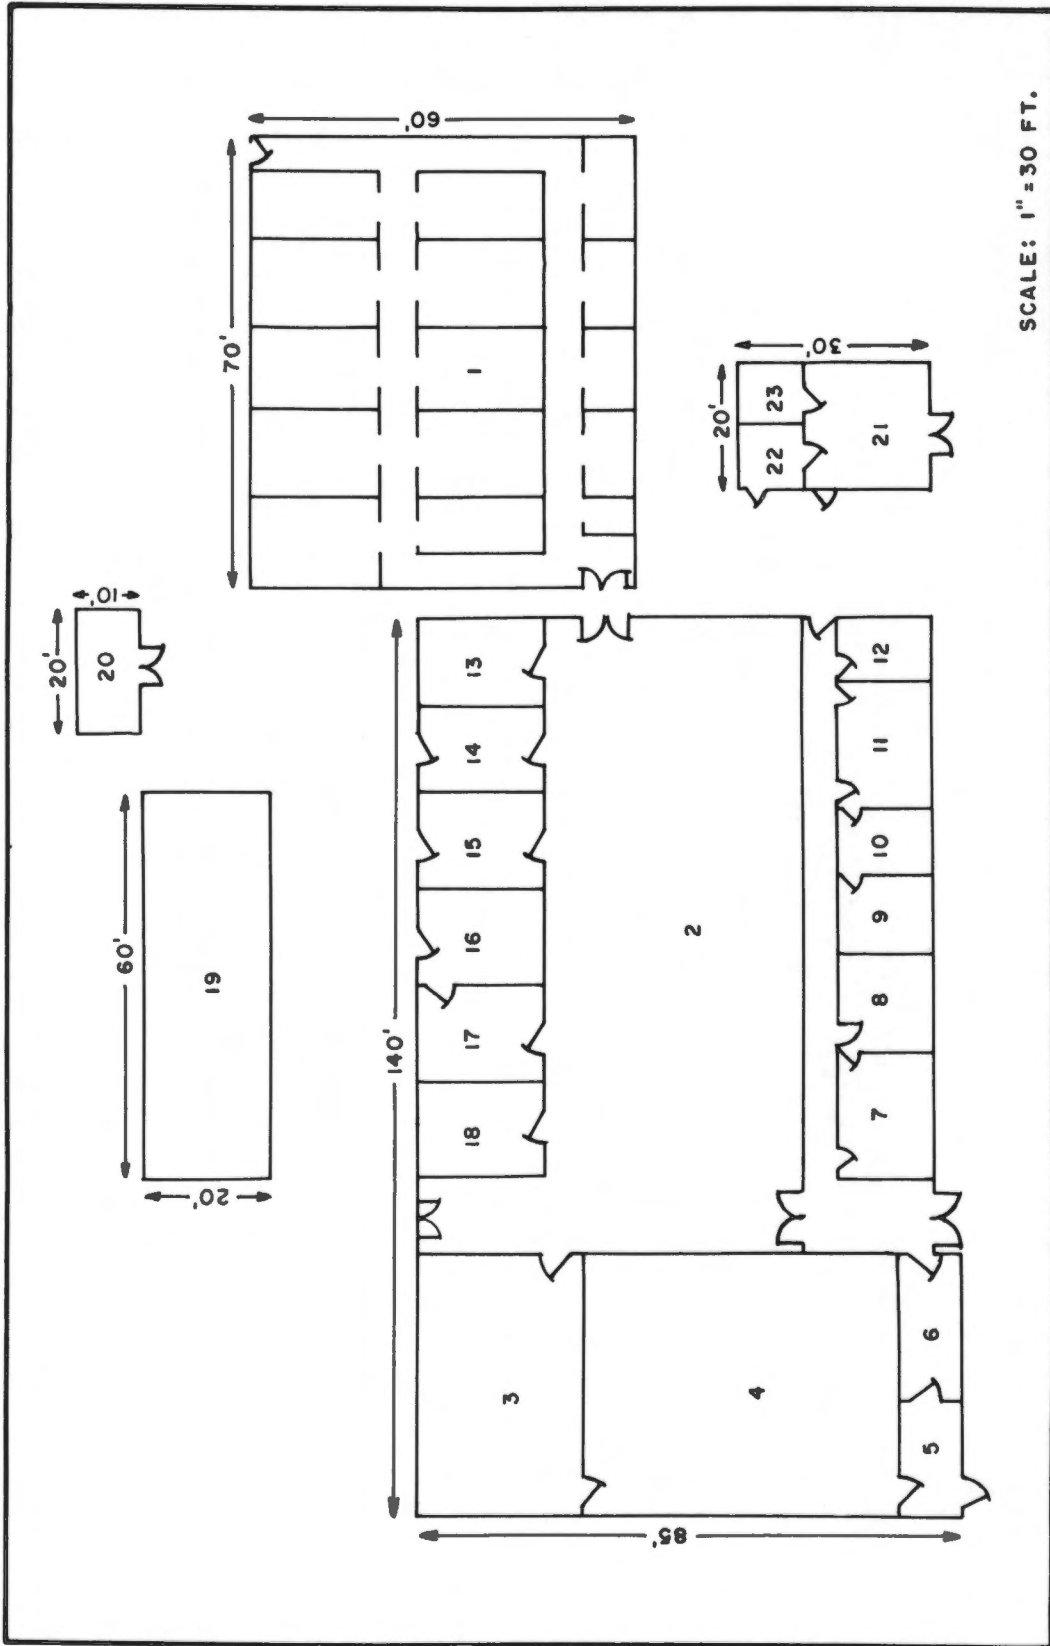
Floor plan of the model sheep slaughterhouse. (See Table XVII for legend.)
